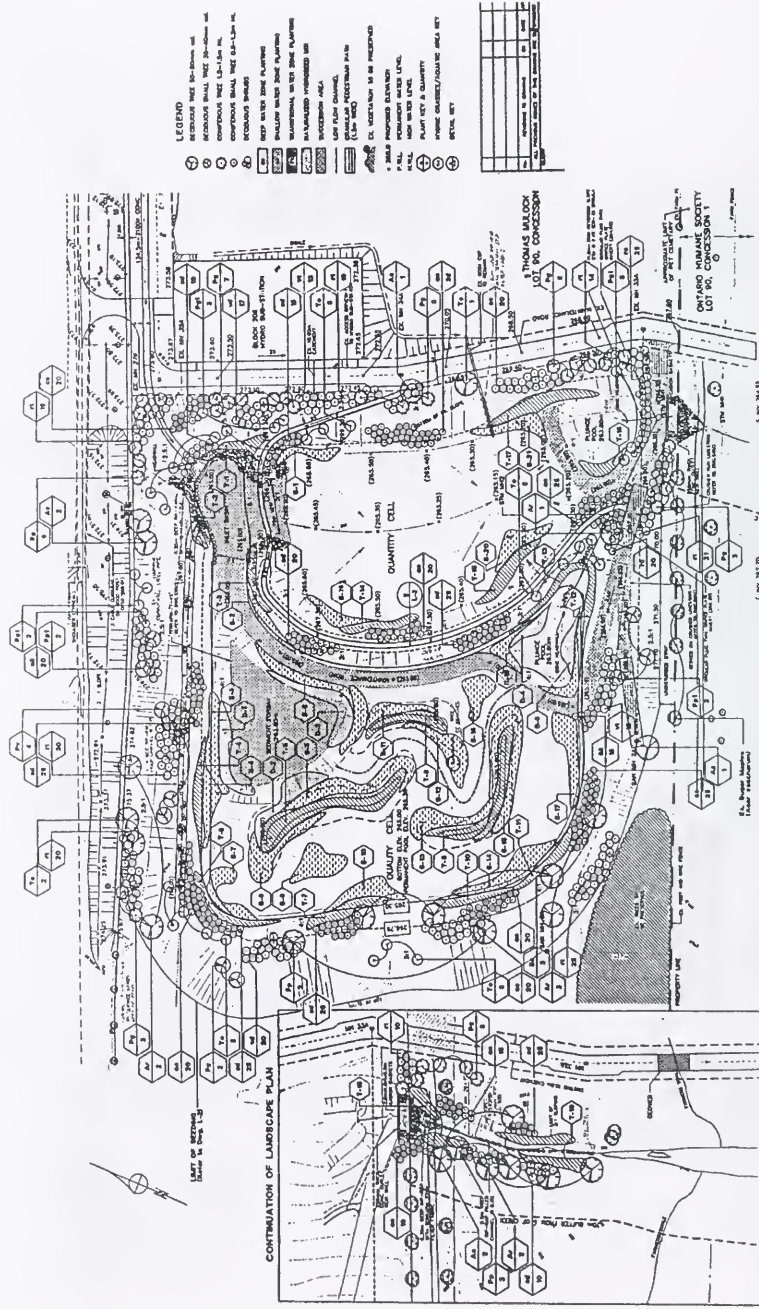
Planting Plan showing the Design of the Artificial Wetland
